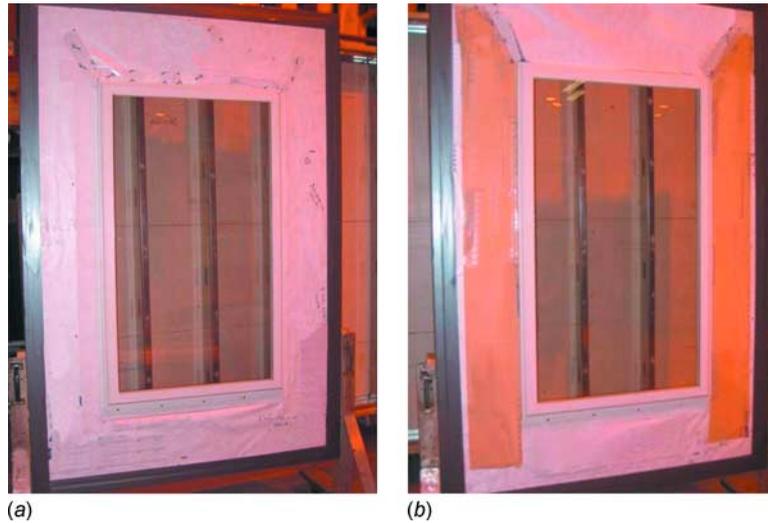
FMA/AAMA 100 completed installations, Wall #1 with 4 in. self-adhering flashing used at jambs and heads (a); Wall #2 with 9 in. mechanically attached flashing used at jambs and head (b).
